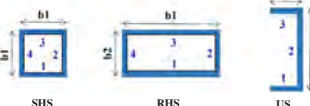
Geometry of aluminum extrusions: square hollow section (SHS), rectangular hollow section (RHS), U-shaped section (US)
